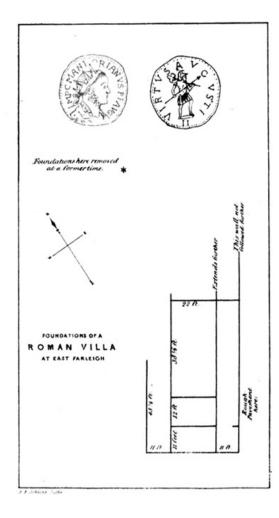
Original plan of East Farleigh building, (Smith, 1839, 57)
